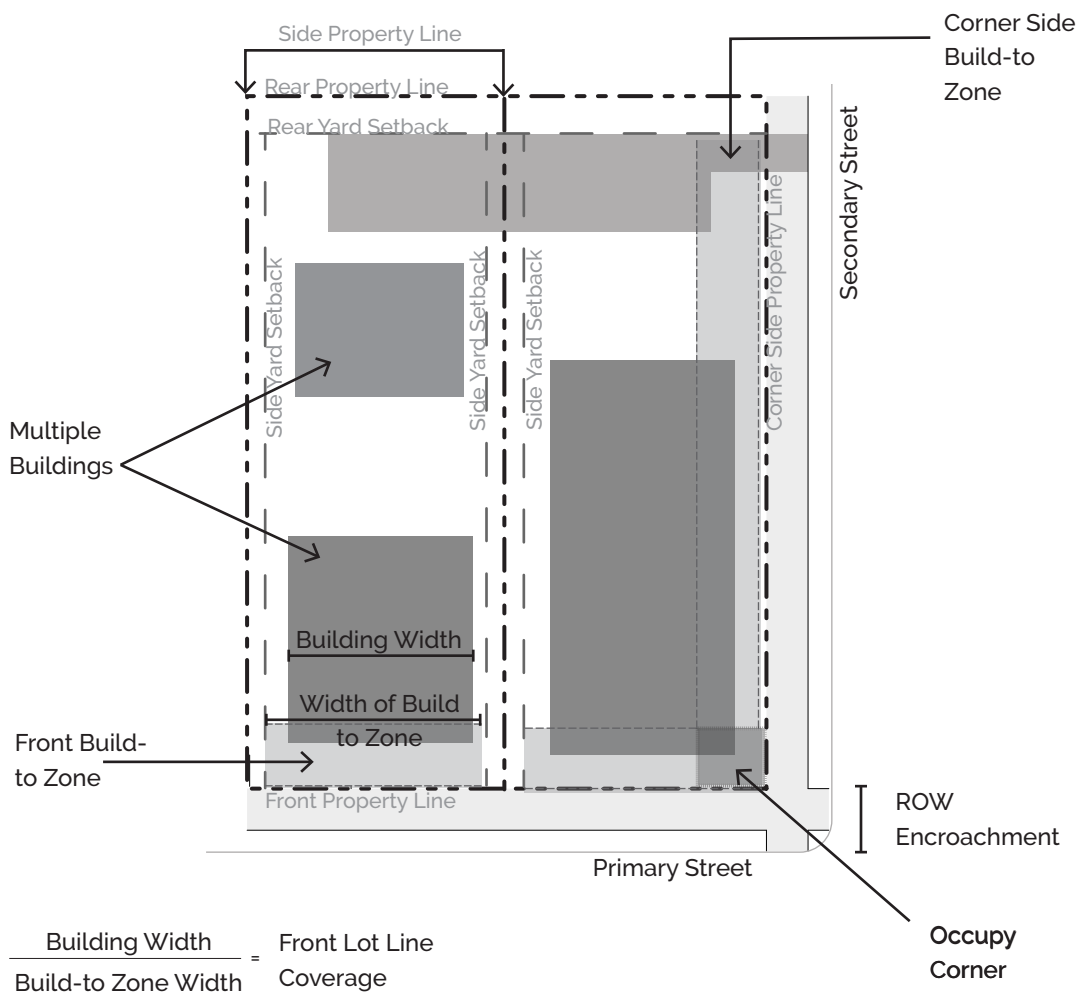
Building Siting Street Frontage, Front Lot Line Coverage, & Lot Area.,
